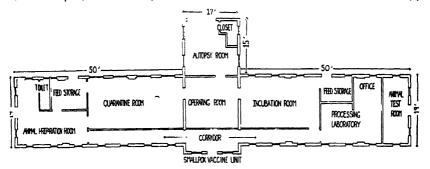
Floor plan of building used for production of smallpox vaccine.
